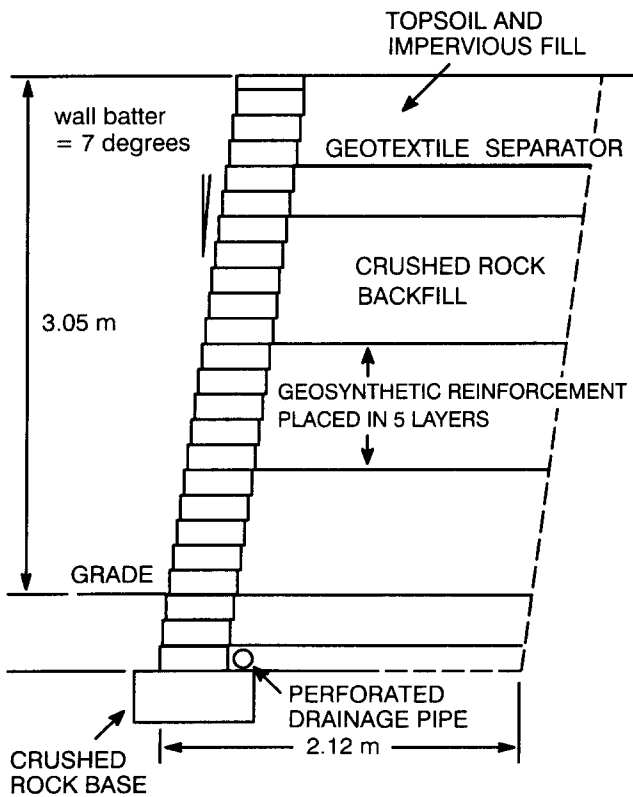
Example cross-section of geosynthetic reinforced segmental retaining wall (after Wetzel et al. 1995)
